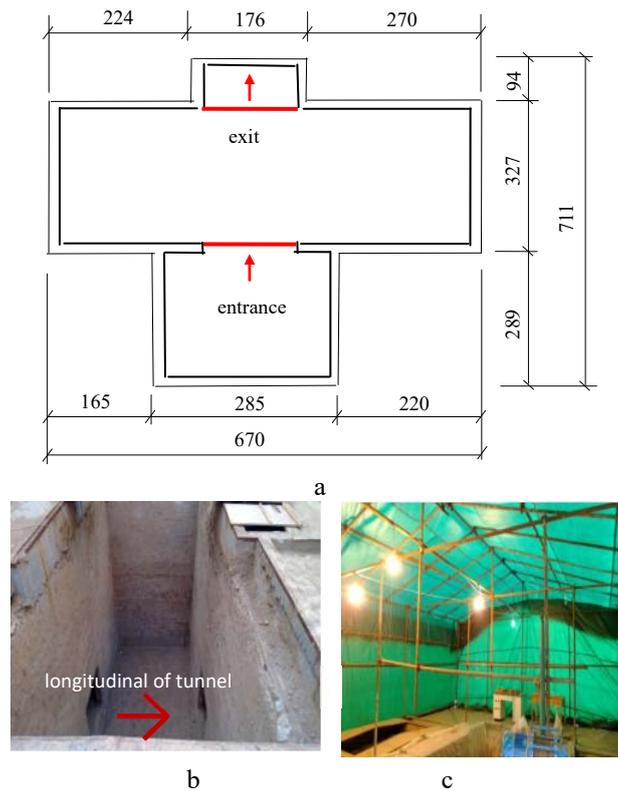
The outdoor test tank (unit:cm). (a) Plane dimensions, (b) Site of test tank, (c) Outdoor canopy
